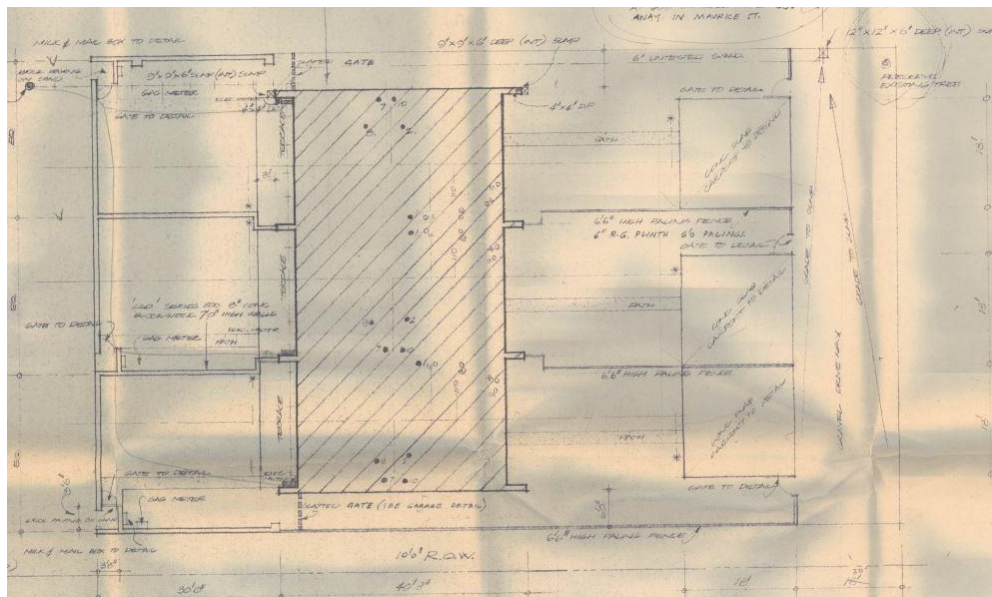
Site Plan for the development of 406 Barkers Road, Hawthorn East (Source: BP 7088).
